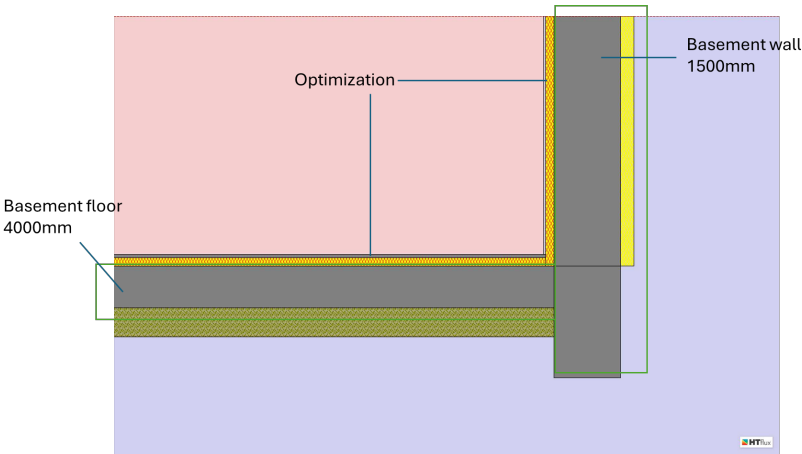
LCA-thermal bridge calculation method-Kindergarten building
